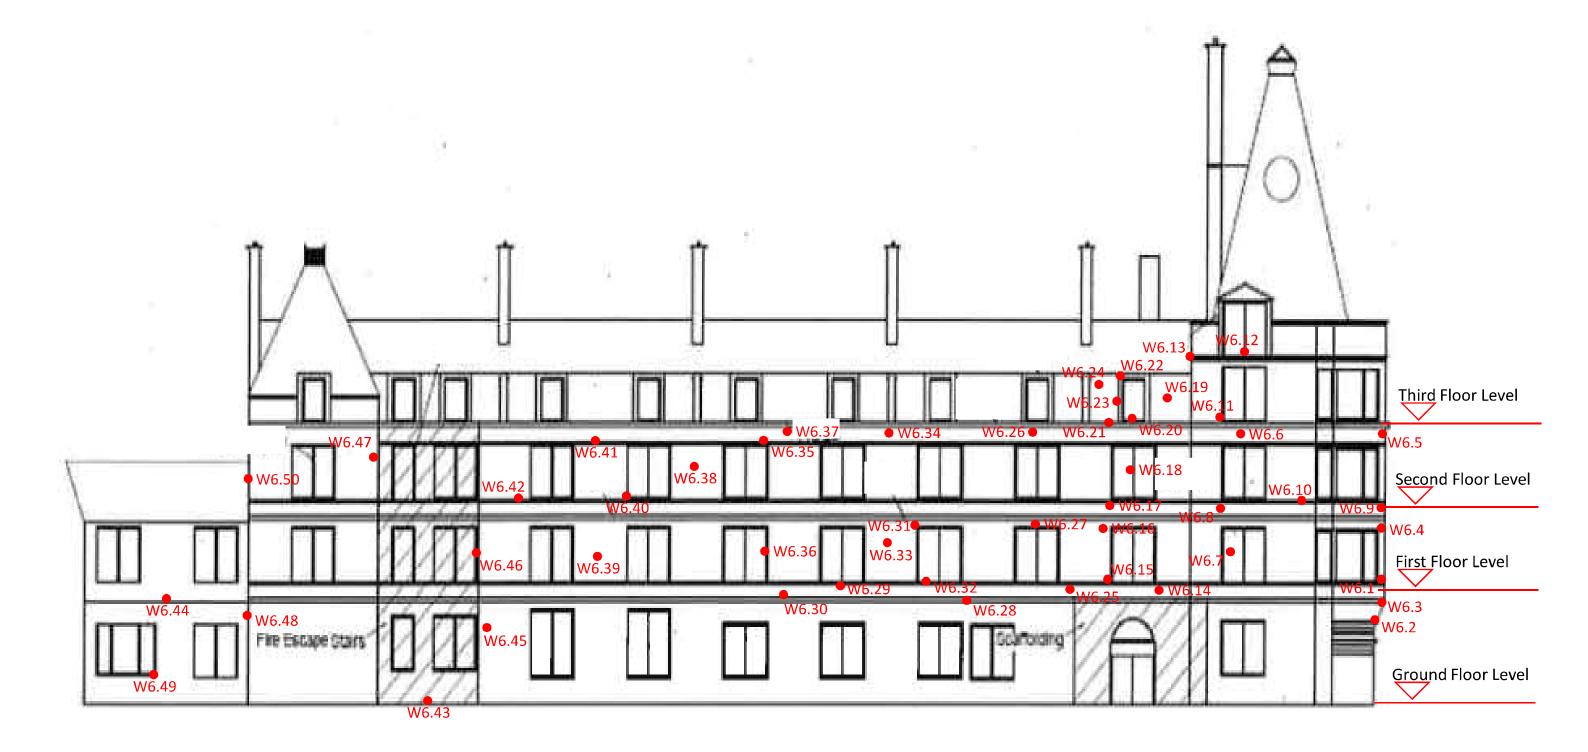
Elevation W6 of Station Hotel Building showing Defect/Observation Locations
